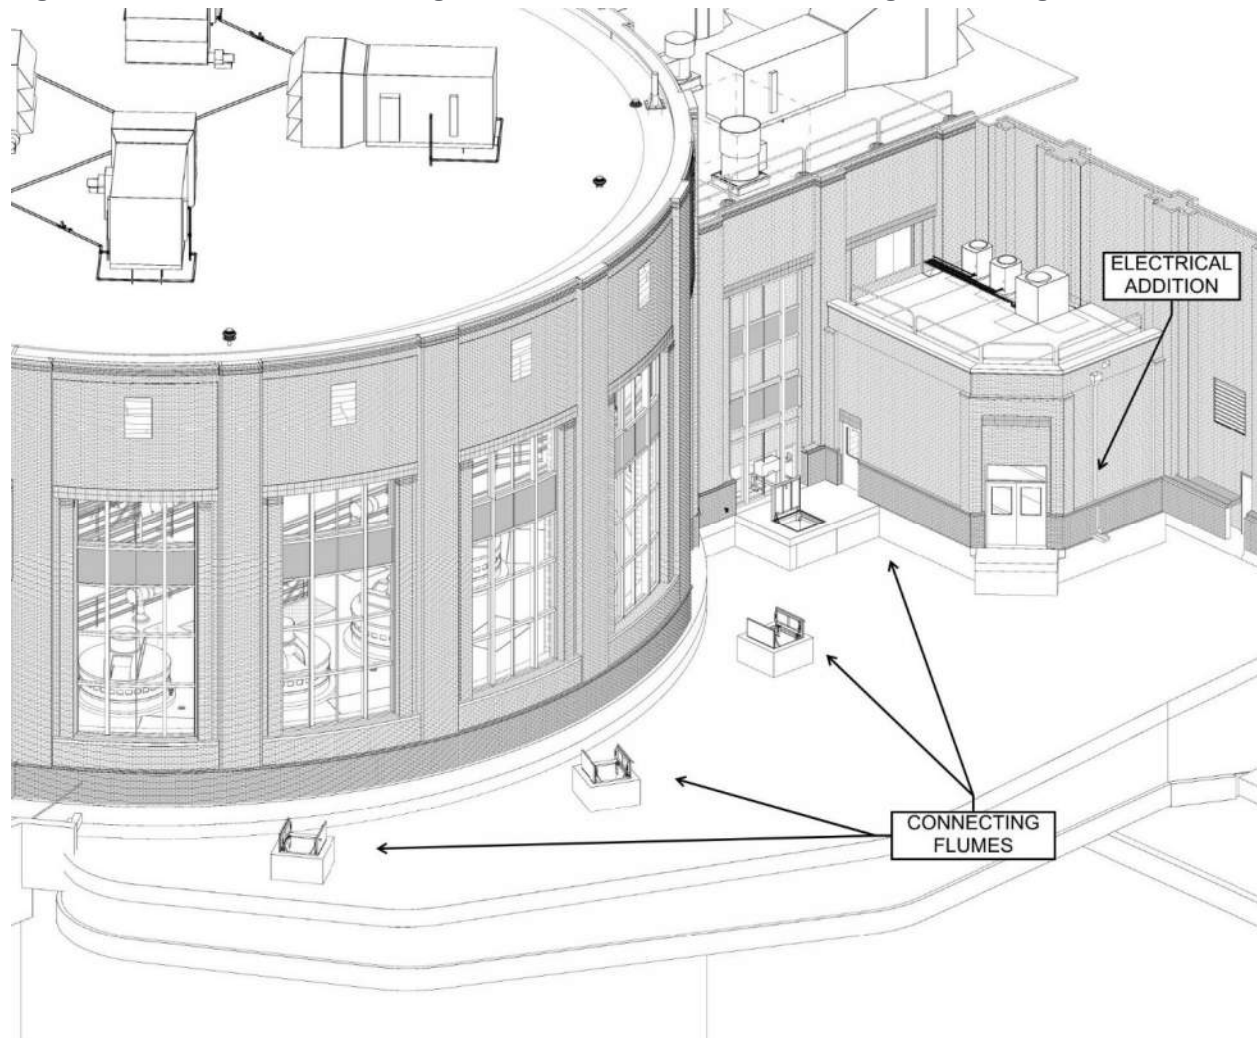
PS-1 Electrical Building Addition Constructed Over Existing Connecting Flumes
